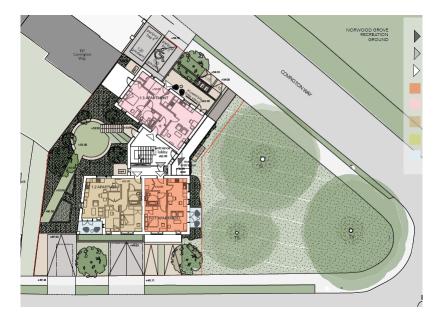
Proposed site plan (Upper Ground Floor Plan)
